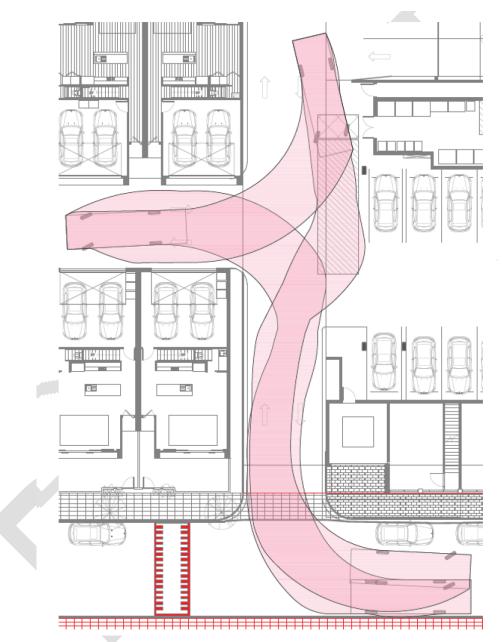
Traffic Engineer modelling of MRV forward entry, on-site manoeuvering to park at collection, and exit to and from site via Opie Ave, including. Reproduced from Traffic Engineer's report (Cirqa, 4 April 2018).
